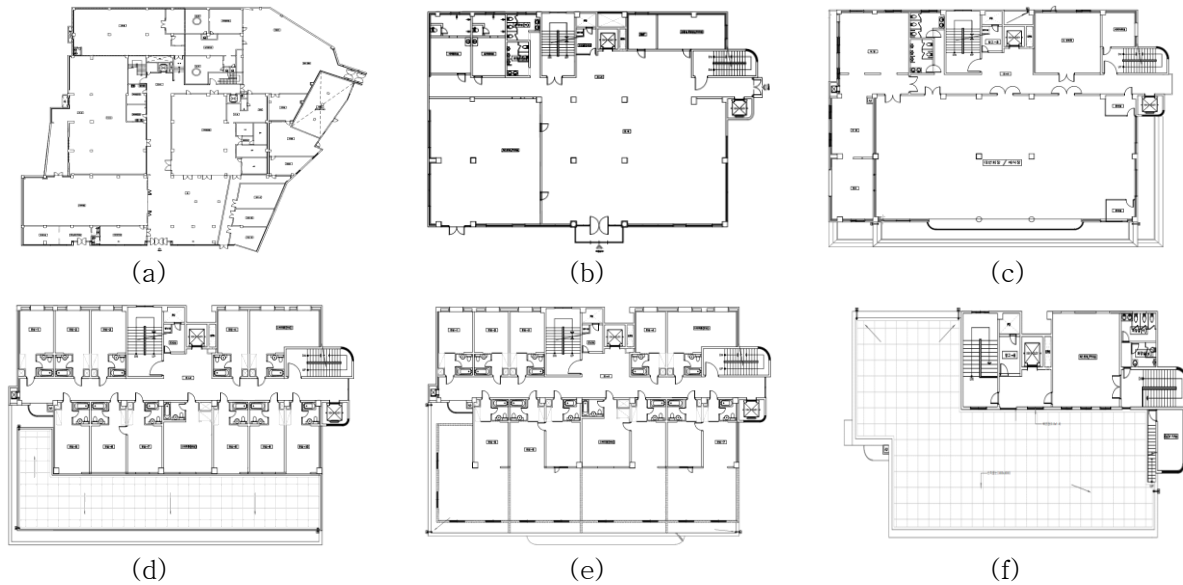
Floor Plan: (a) B1, (b) 1F(Evacuation Floor), (c) 2F, (d) 3F, (e) 4F~7F (f) 8F
